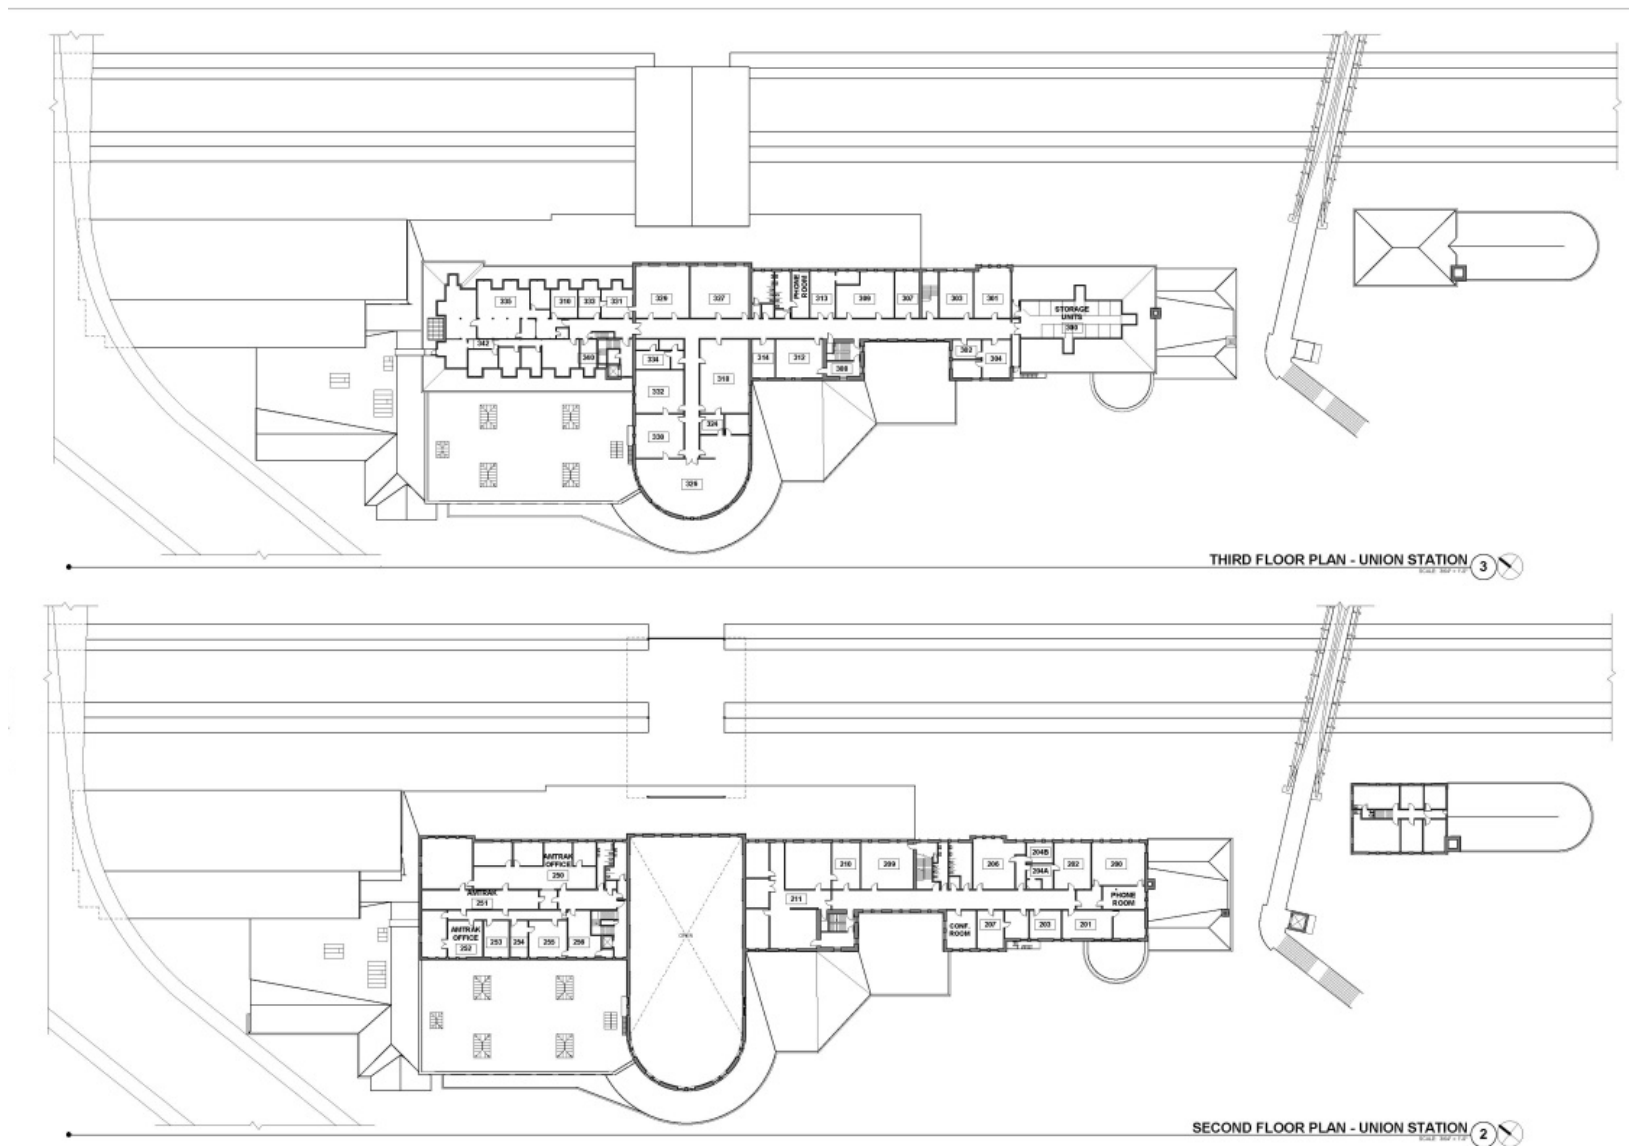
Union Station Existing Floor Plans - 2nd and 3rd Floors
